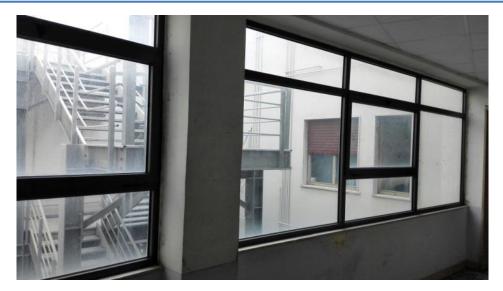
ACTUAL WINDOW AT FIRST FLOOR
